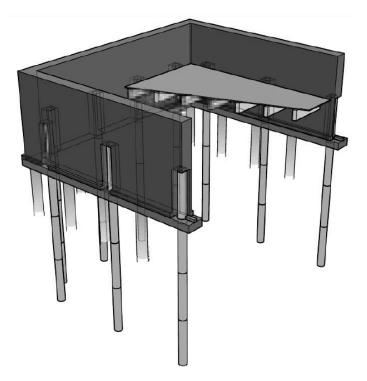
Jack-down piles from a wall (VROM, VNG, 2009).
